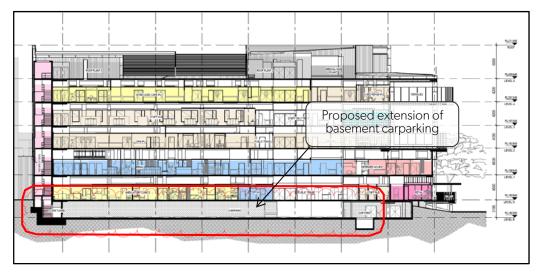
| Section plan (north to south, looking west) of the basement carpark extension (Source: Modification documents)
